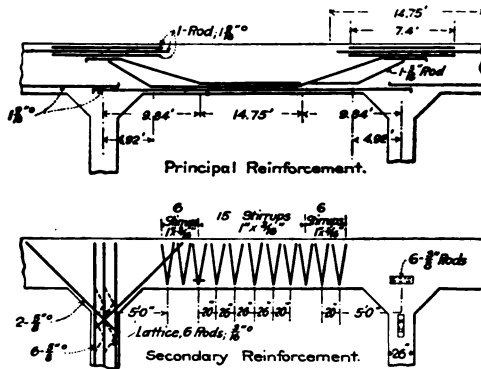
Girder Reinforcement, Guadalquivir River Viaduct.
